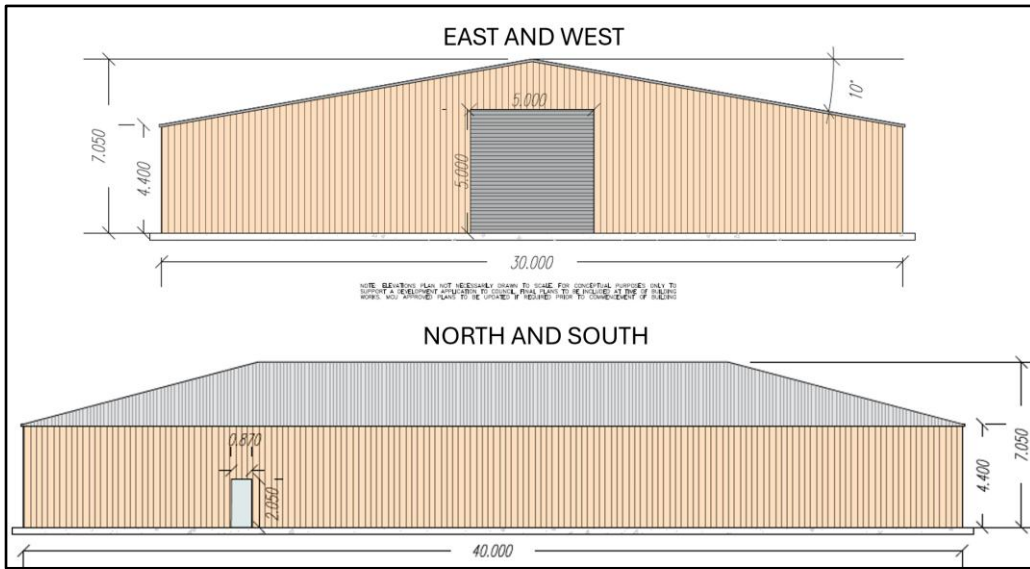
Proposed Elevations - Baird & Hayes – Elevations Plan
